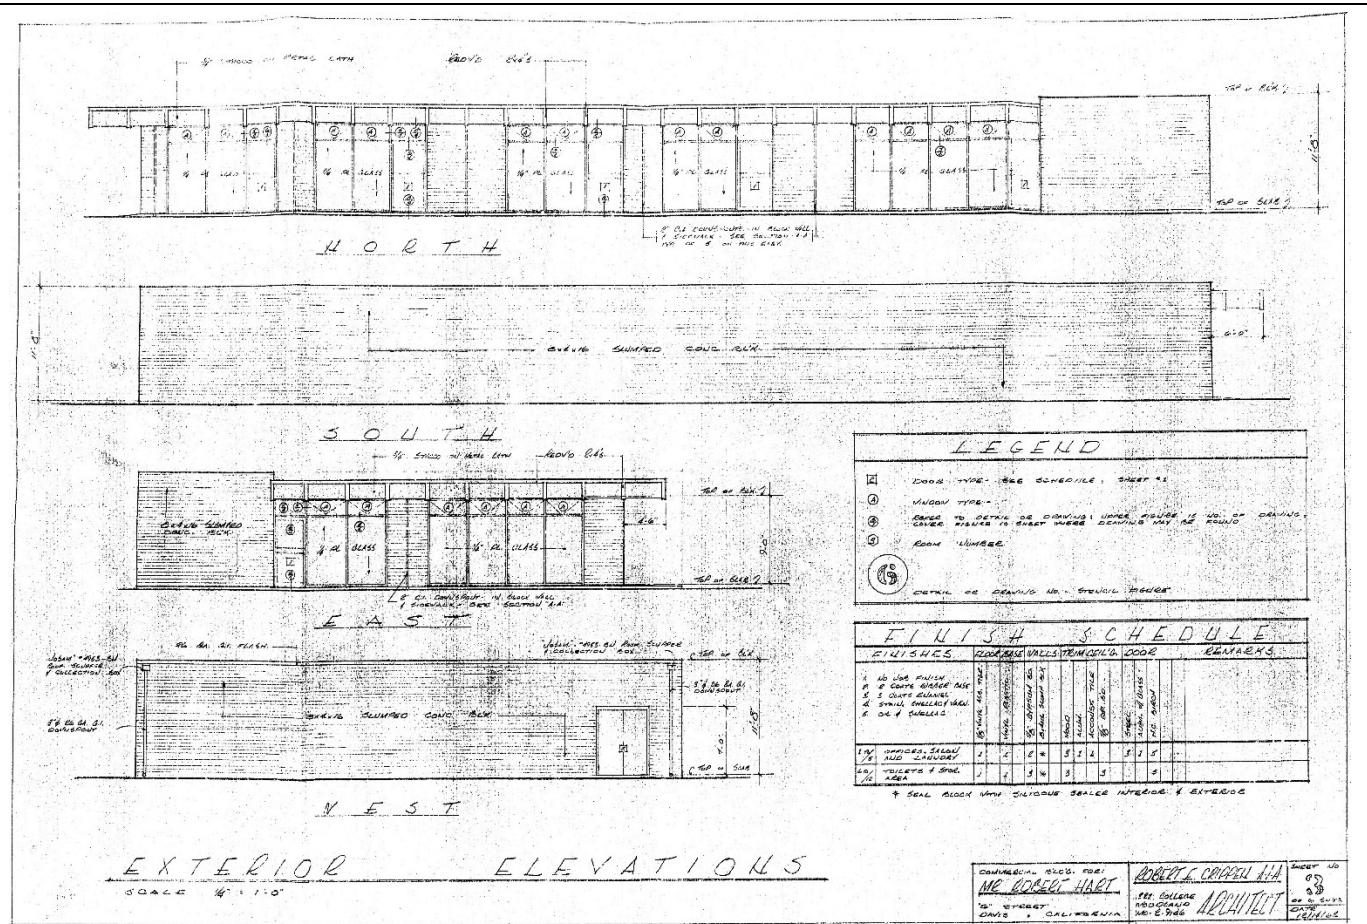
City of Davis, Permit archives for 407 G Street, Elevations for proposed building for Mr. Robert Hart, 12/14/62.
